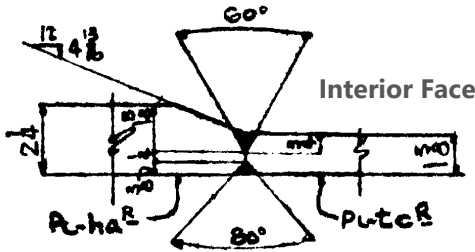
Side plate complete joint penetration groove weld details from shop drawings
